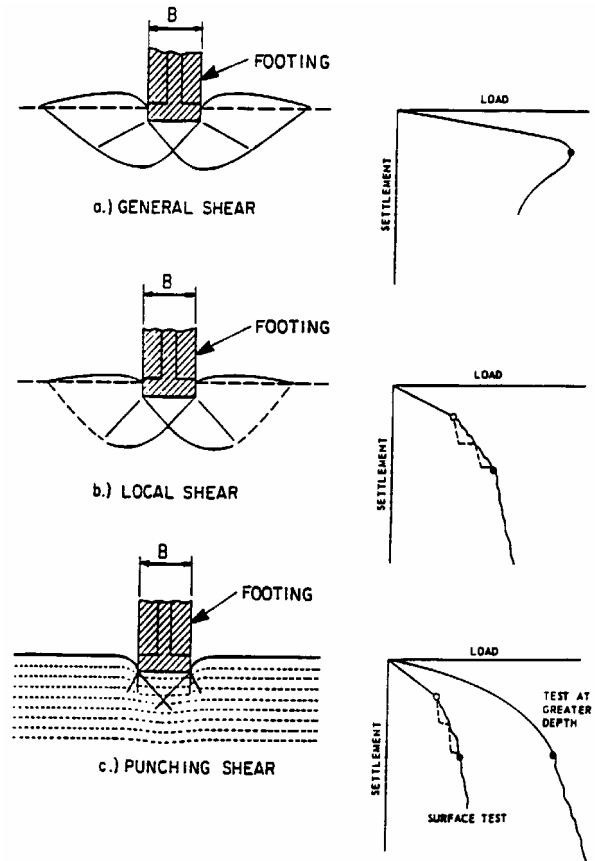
1 Bearing Capacity Failure Modes for Footings on Soil (Vesic 1963).
